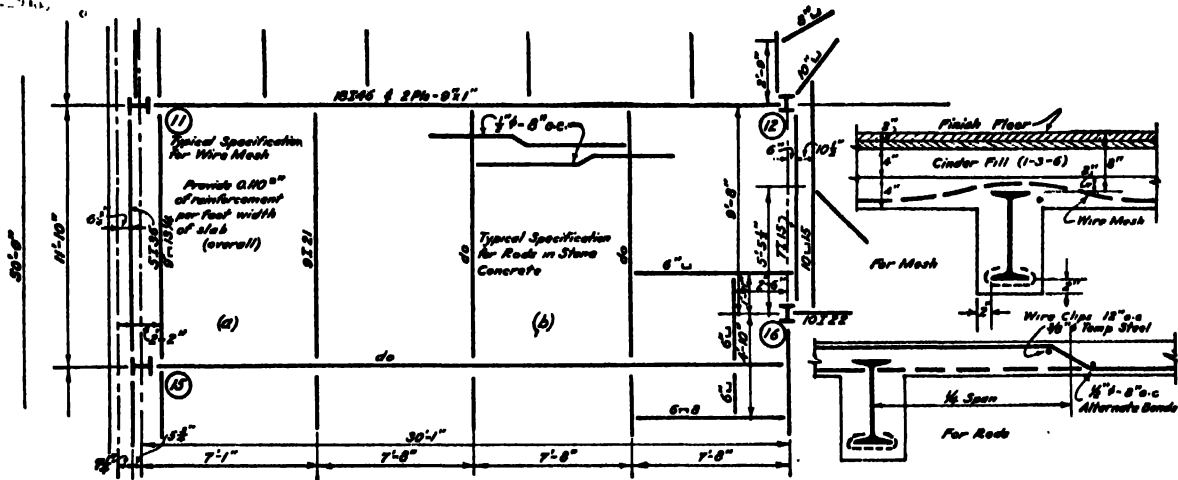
TYPICAL PLAN INDICATING REINFORCEMENT
